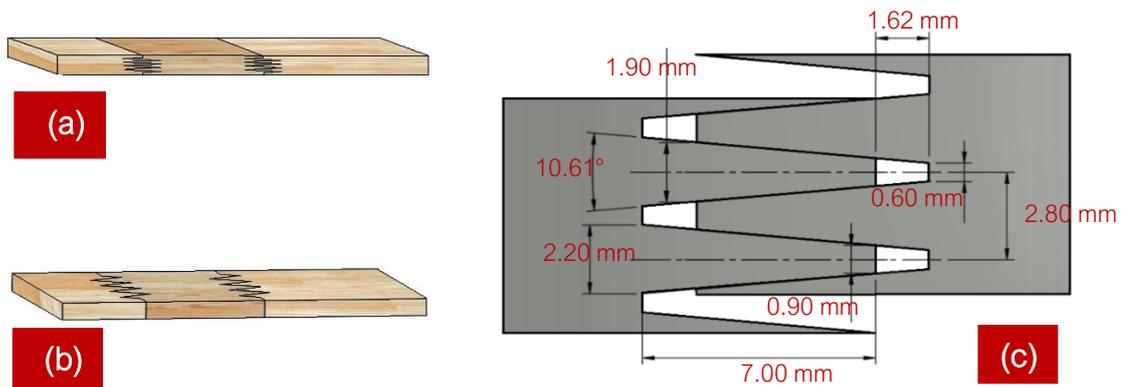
Finger Joint Details; a) Horizontal Finger Joint, b) Vertical Finger Joint, c) Red Stag standard 7 mm Finger Joint.
